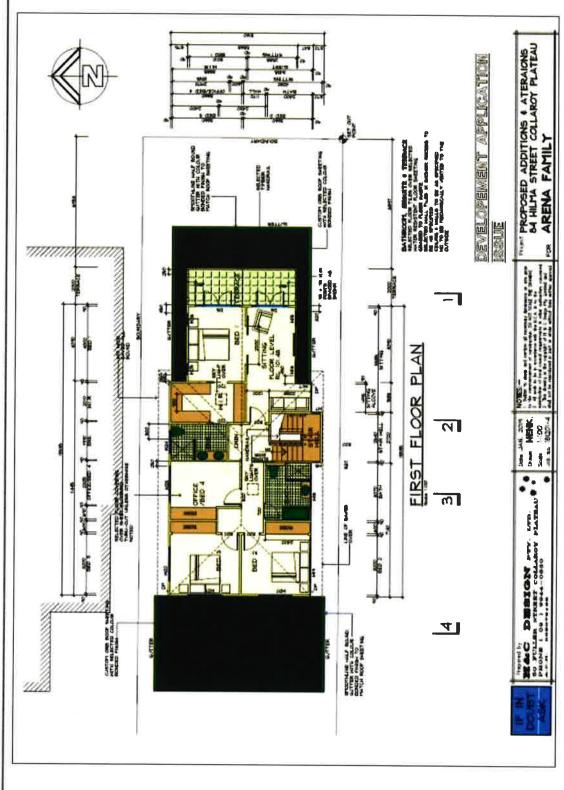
Page 8, 9 & 10: Illustrates proposed Alterations/Additions to the existing dwelling residence including new inground swimming pool & new landscape concept.
